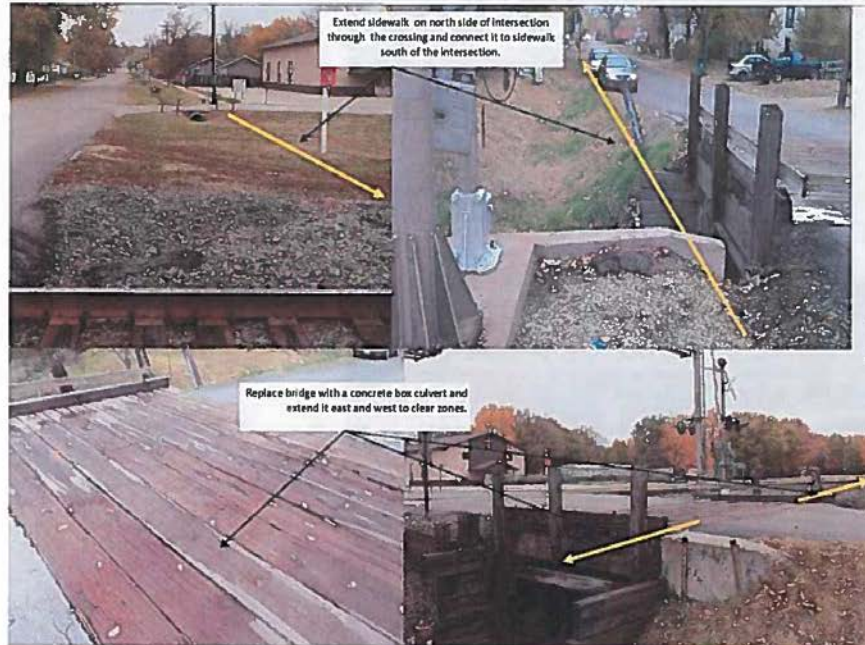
Photos of high-cost recommendations at UP Railroad & Walnut Street crossing
